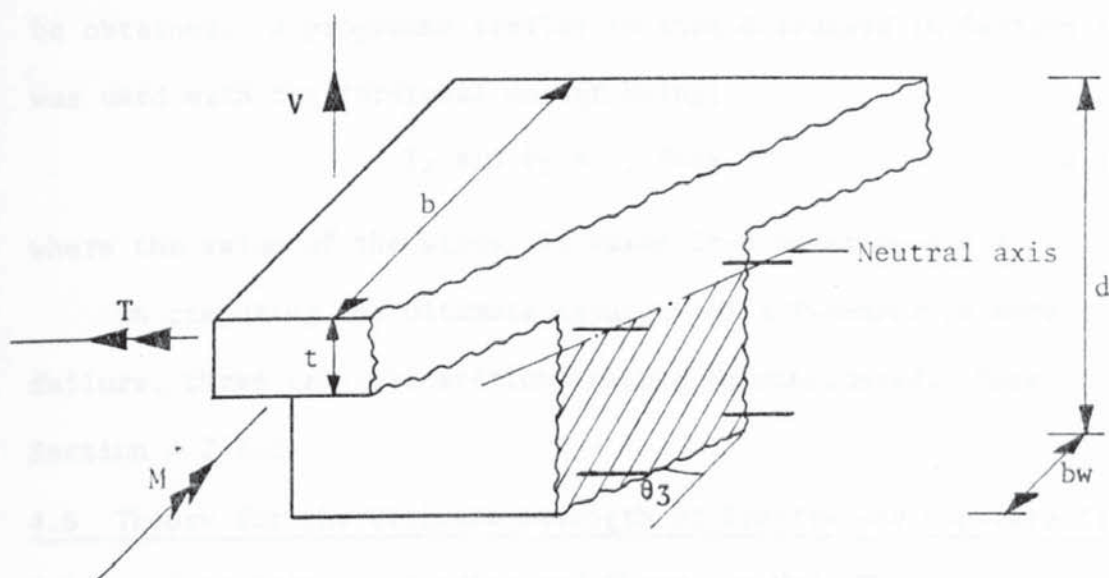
MODE THREE FAILURE IN PRESTRESSED CONCRETE T-MEMBERS UNDER COMBINED LOADING
